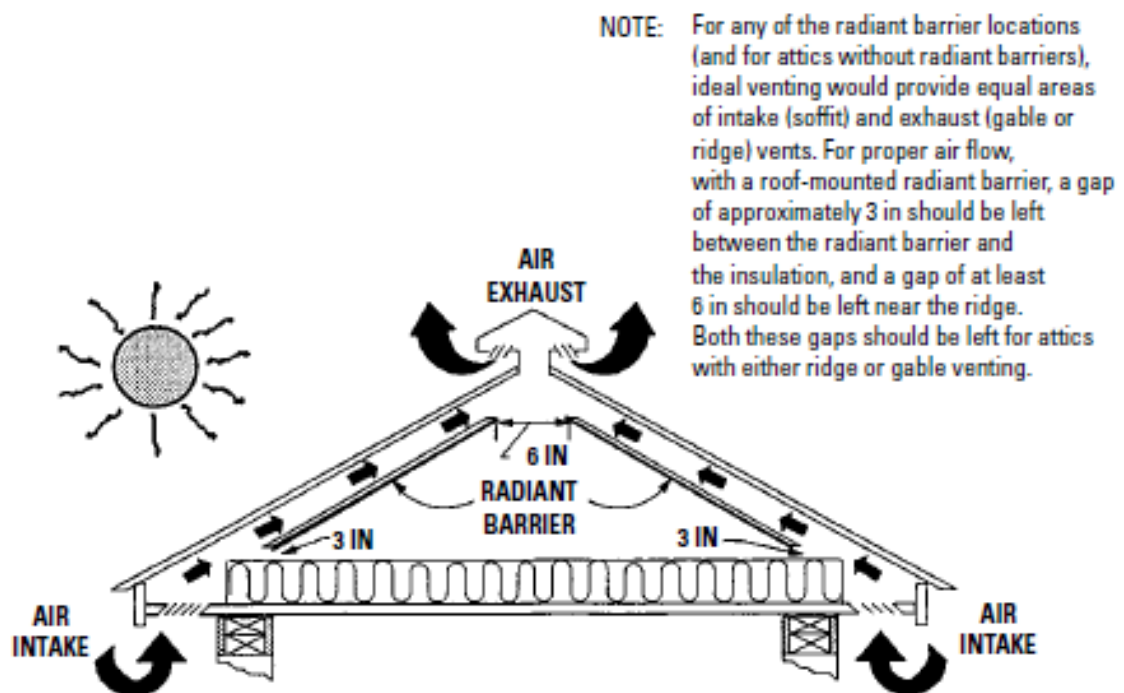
Cross-section of attic showing attic ventilation paths.
